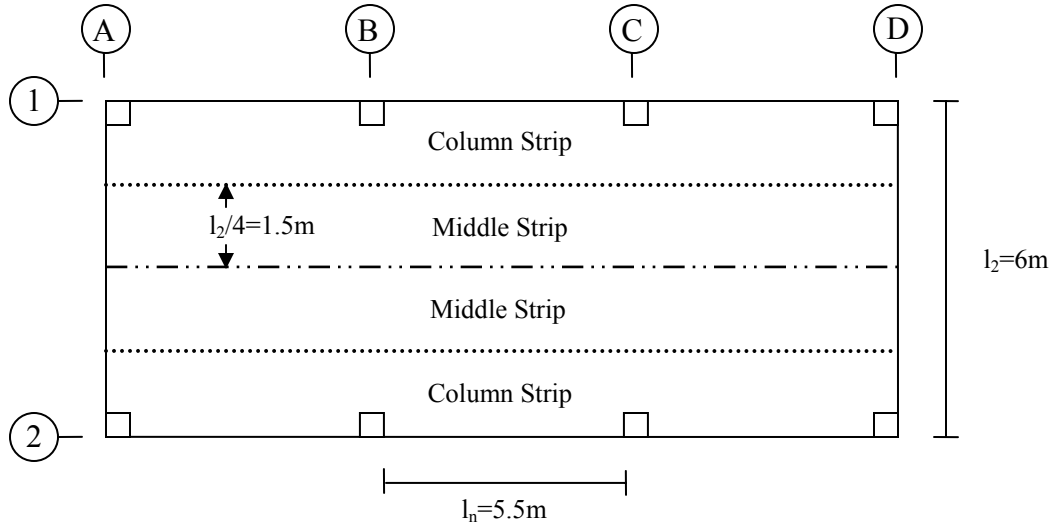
Column and Middle Strips Used in Slab Reinforcement Calculations
